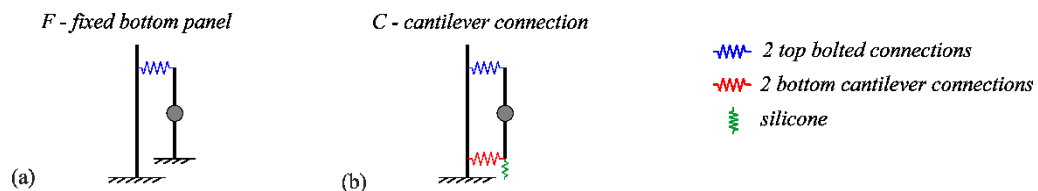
Connection of the bottom panel to the foundation: (a) panel fixed to the foundation, (b) panel attached to the column
